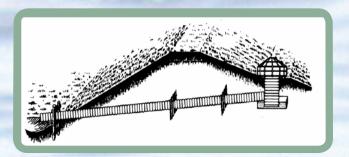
A schematic drawing of a large pipe drop structure. (source: NRCS Engineering Handbook, Chapter 6)
